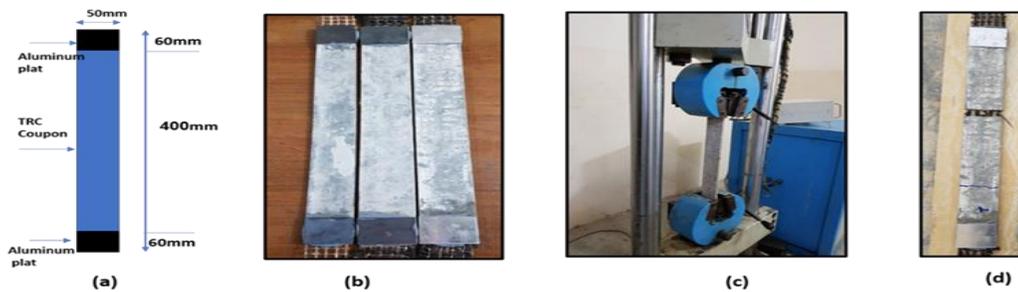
Details of tensile tests on TRC coupons, (a, b): Model details, (c): Model's test setup, (d) Failure mode of textile coupon
